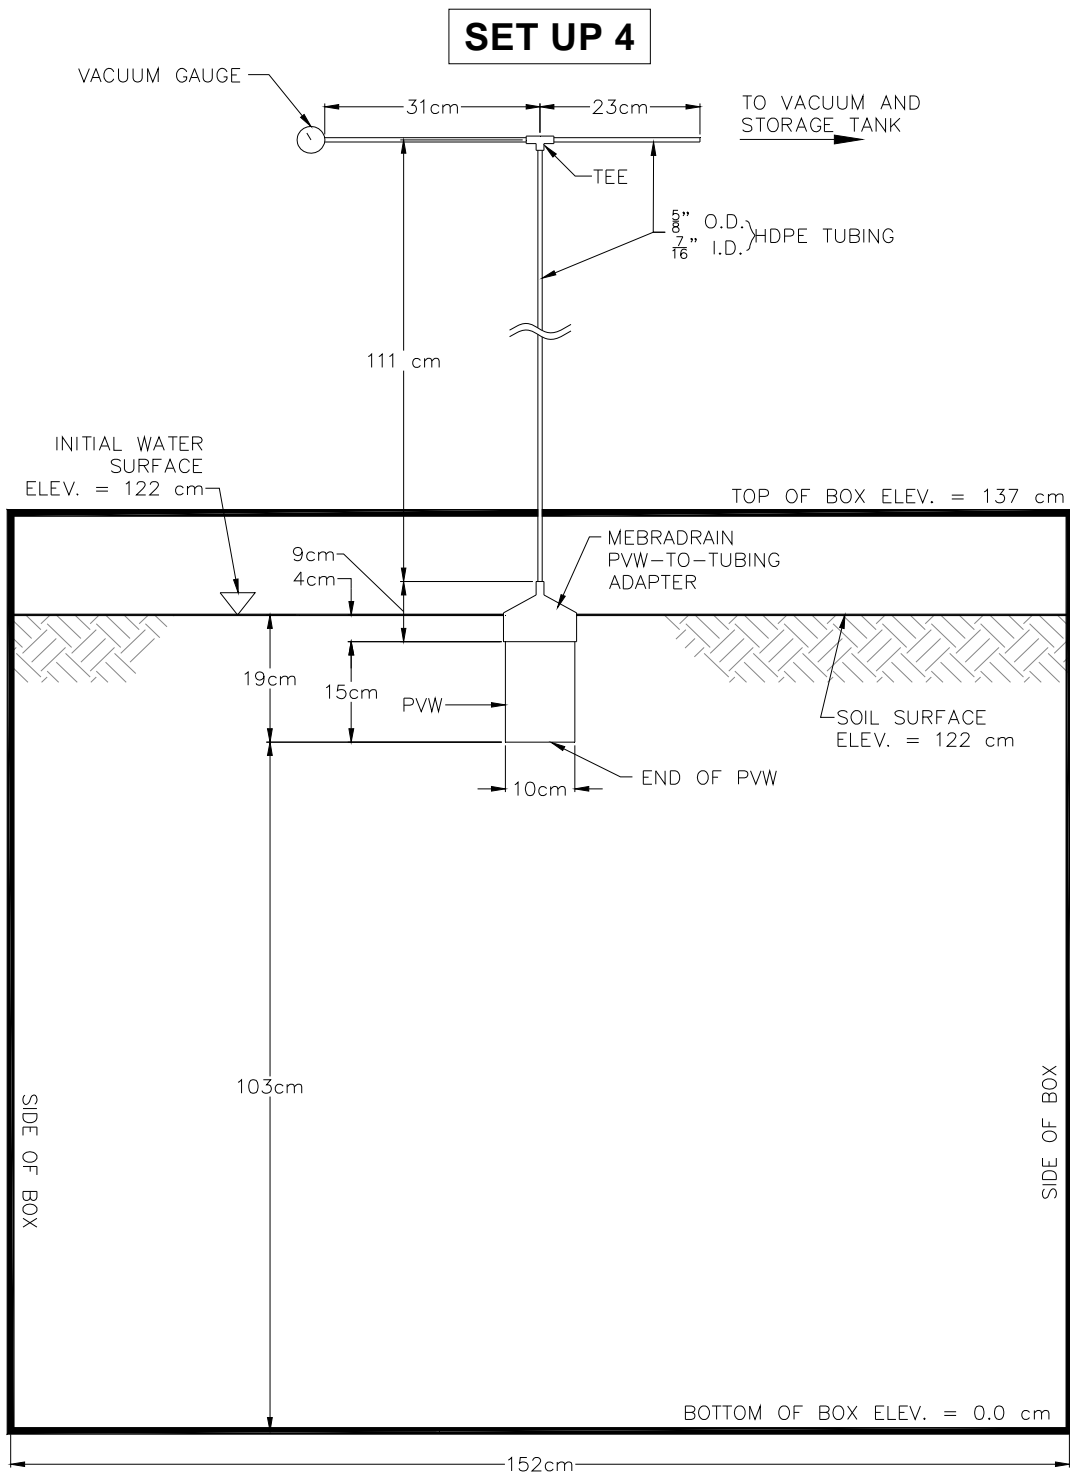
Cross-Section Detail of PVW Installation (Setup 4)
